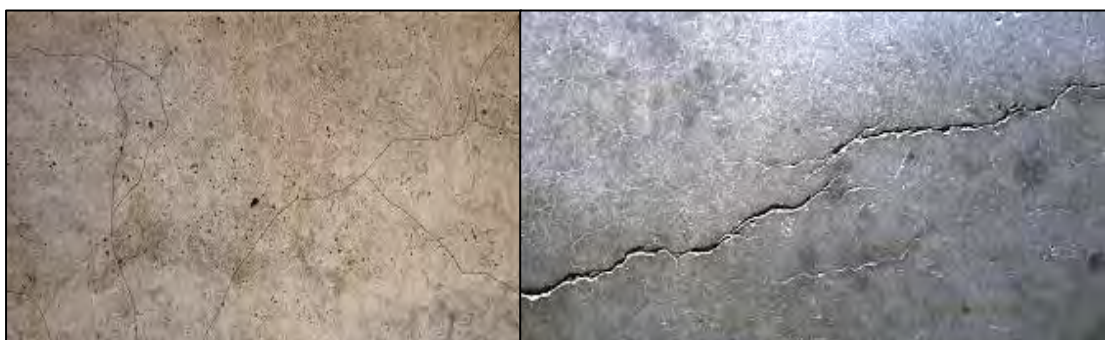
Random Plastic Shrinkage (left) and a Horizontal Dry Shrinkage Cracks (right)
